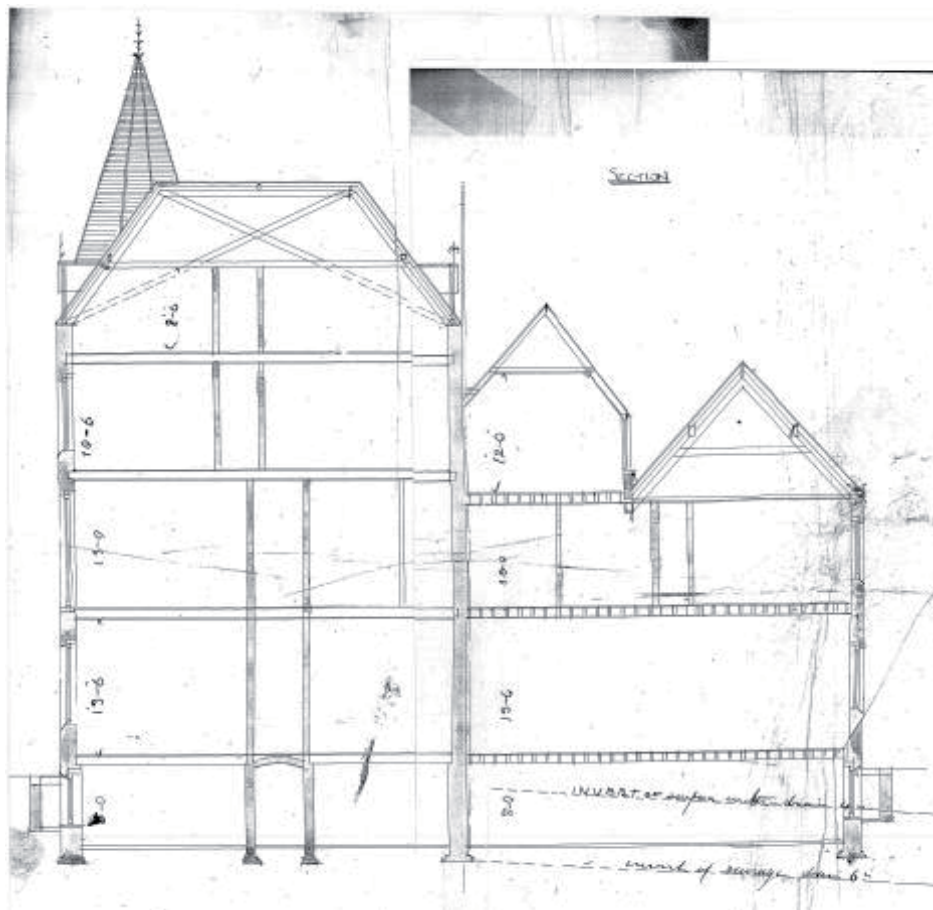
Proposed cross-section of the hotel, facing south-west with Abbey Road to the left and High Street to the right
